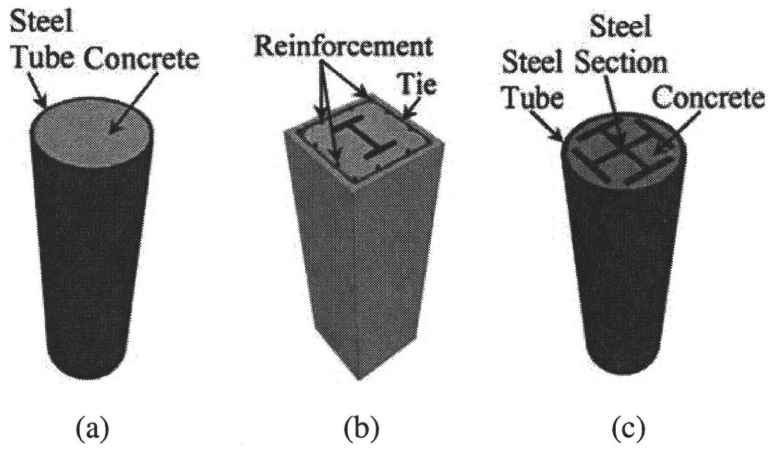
(a) CFST column (b) concrete-encased steel column (c) steel tubular column filled with steel reinforced concrete
